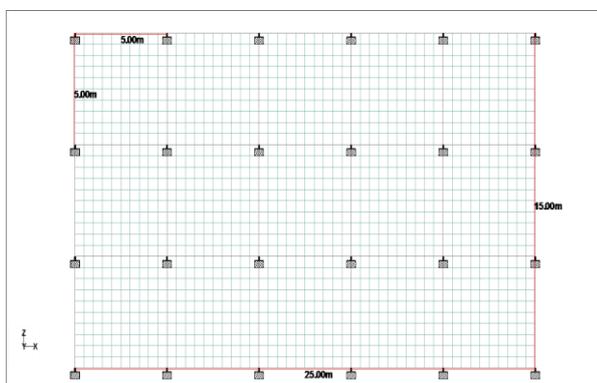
Typical Floor Plan for all 9(G+8) Floors with plate frame
